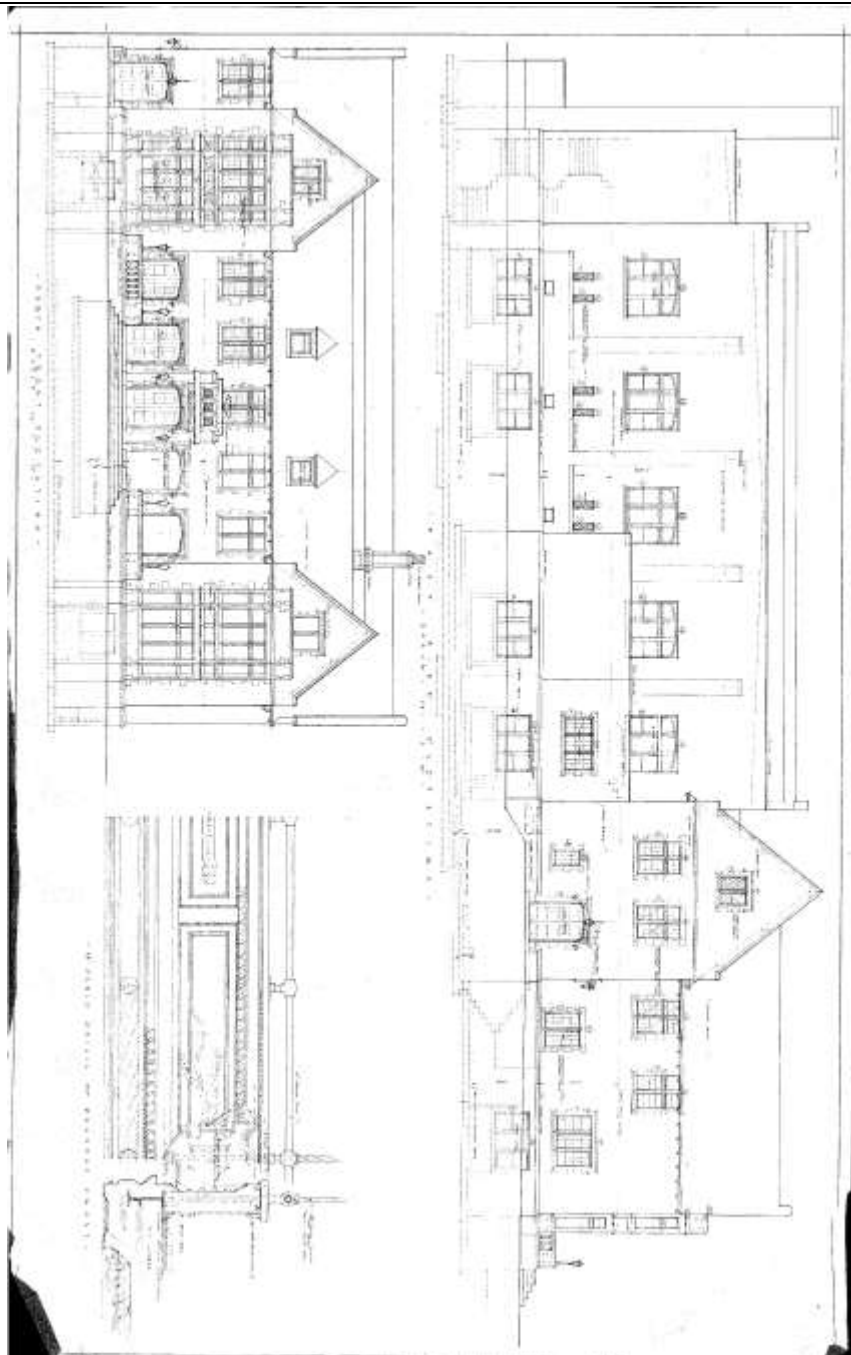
Blueprint of north & east elevation plan by architect Henry Auler
